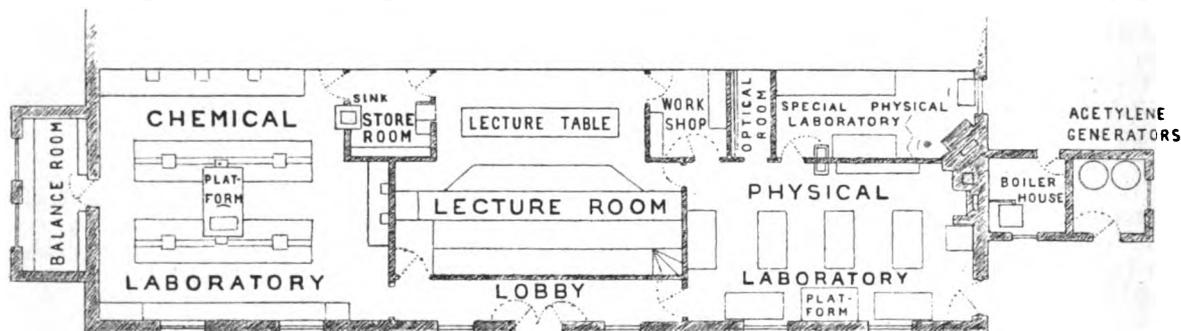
Plan of new Science Buildings at Felsted School. (Scale, $\frac{1}{8}$ " to a foot, nearly.)
